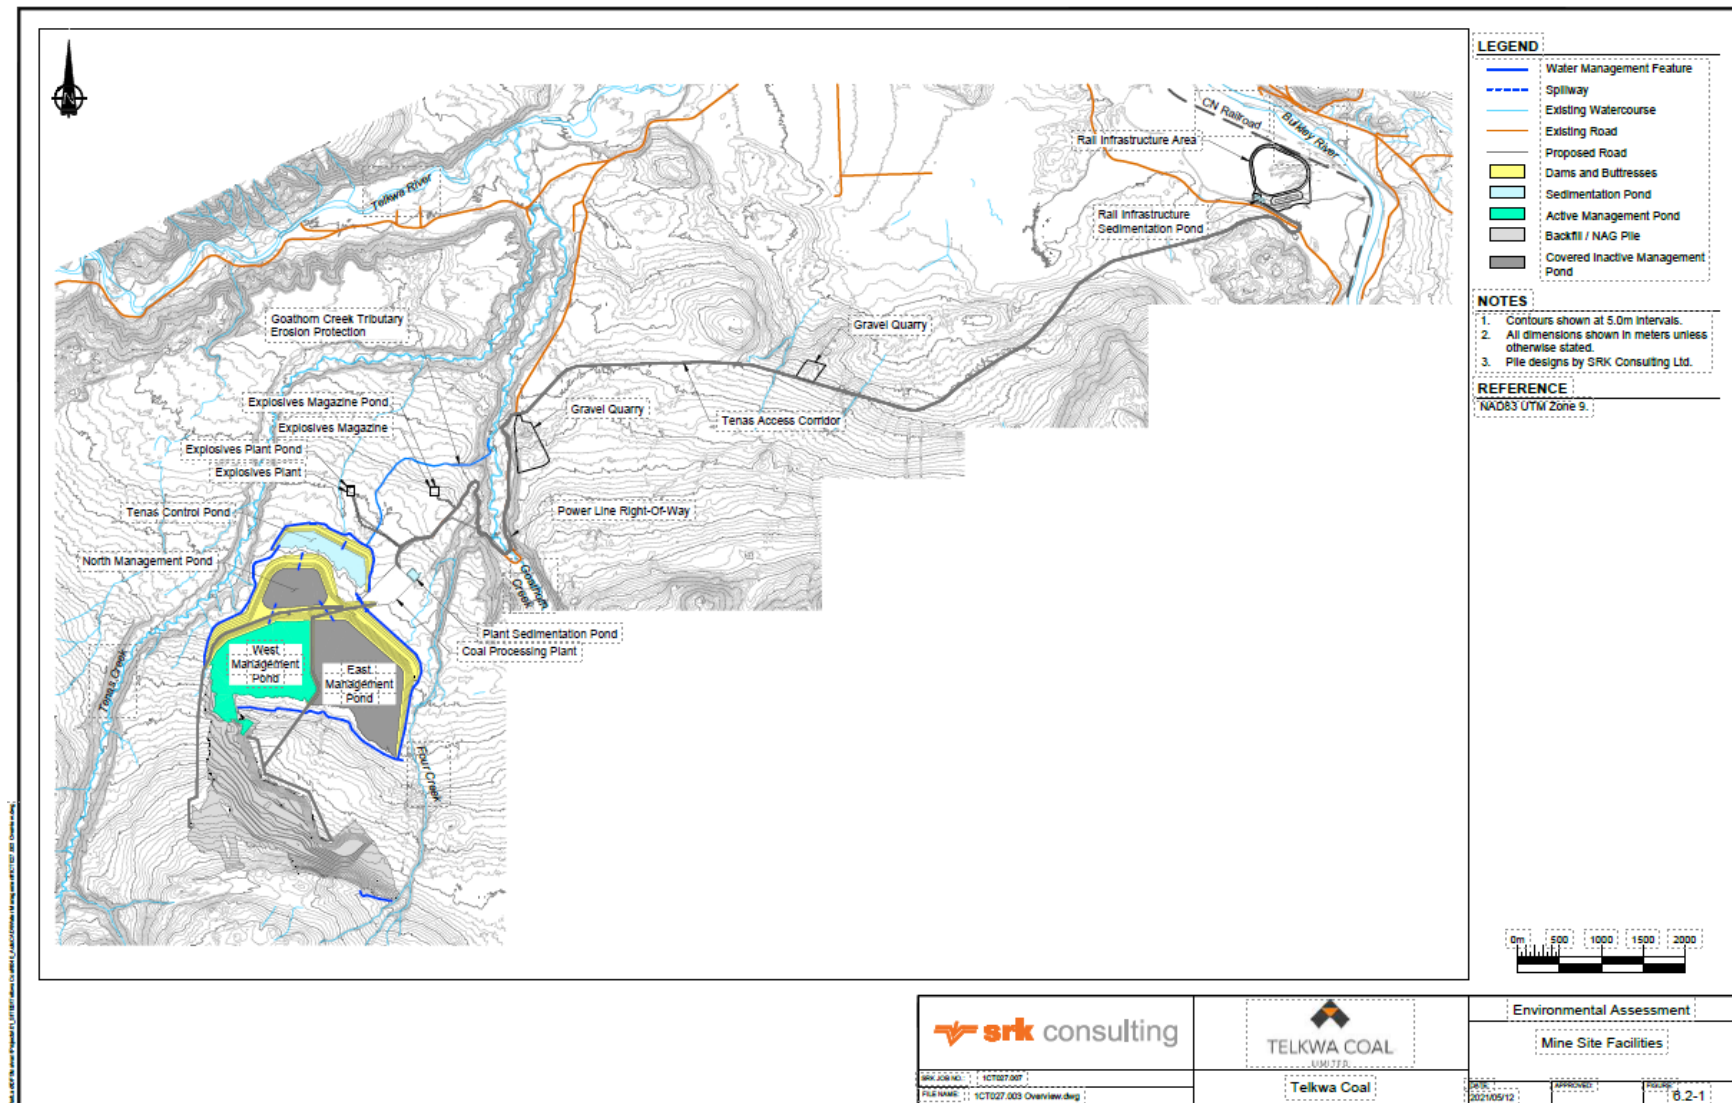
Tenas Project Proposed Project Footprint and Facilities
